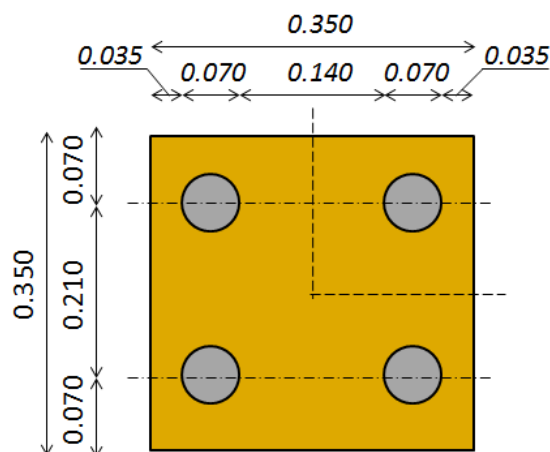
Columns' pattern under the shallow foundation (dimensions in meters)
